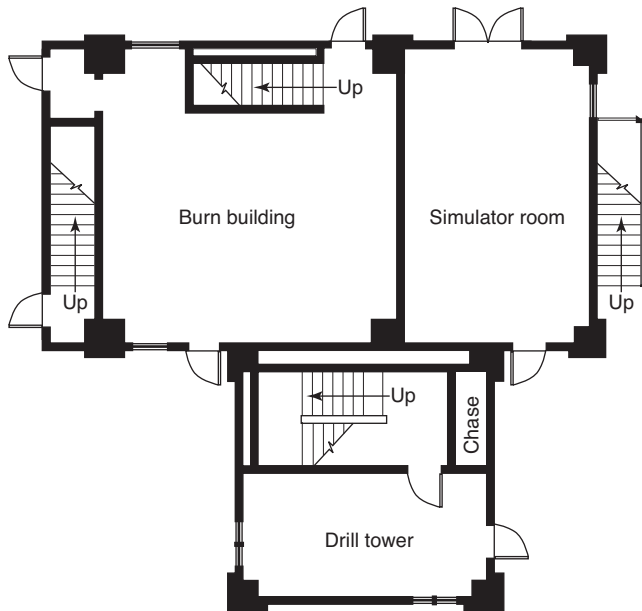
Drill Tower/Burn Building Floor Plan. (Courtesy of Severns, Reid & Associates, Champaign, IL.)
